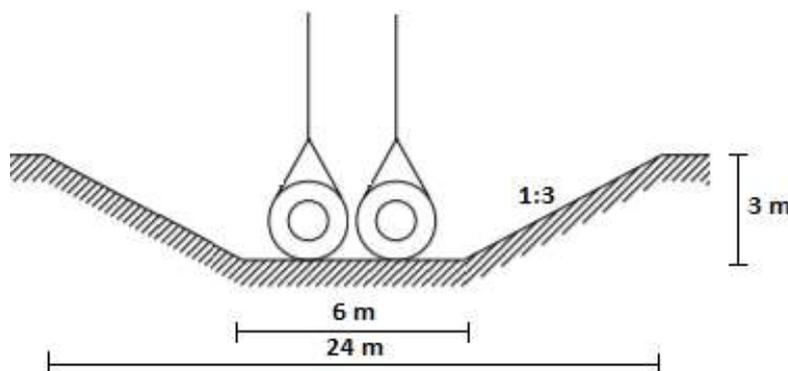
Cross-section of trench for the curved section of the outfall.
